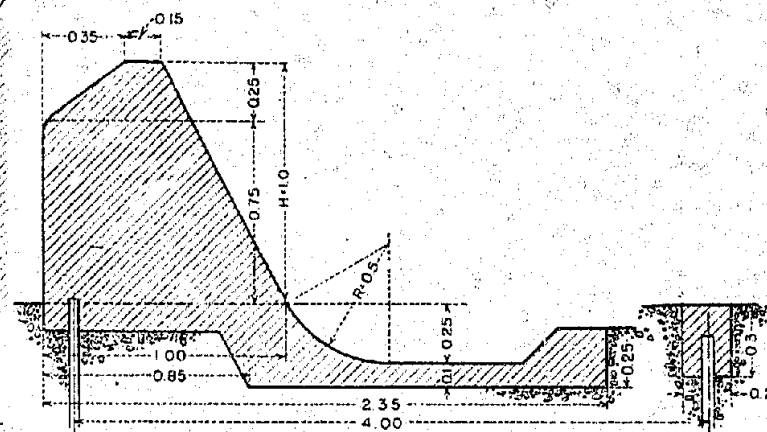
DAM WITH CHECK SILL DESIGNED BY A.C. KÖNIG. (ALL DIMENSIONS ARE IN TERMS OF THE HEIGHT, H , TAKEN AS A UNITY).
